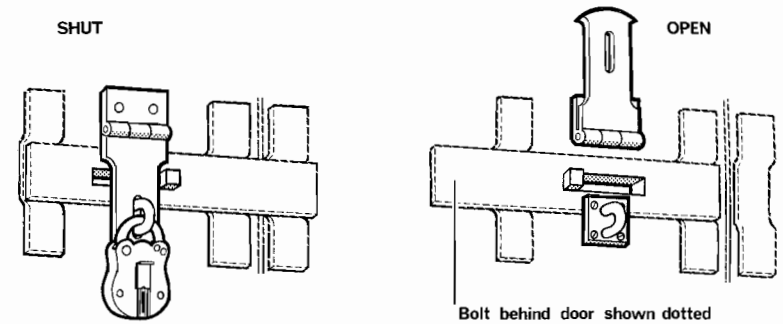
The Liverpool salvage bolt method of providing for authorised forcible entry. Left: the bolt secured. Right: the padlock struck off and the bolt withdrawn.
